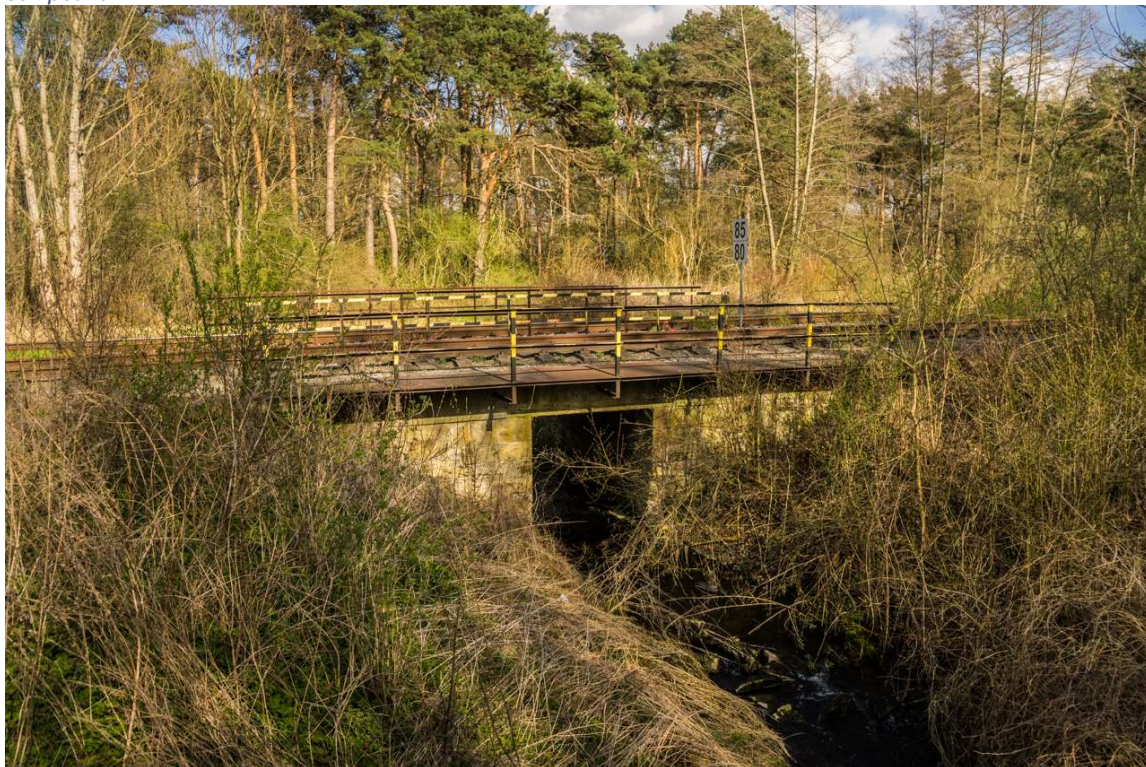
concrete beam bridge located on the side-track of the branch line at the entrance to the airport
